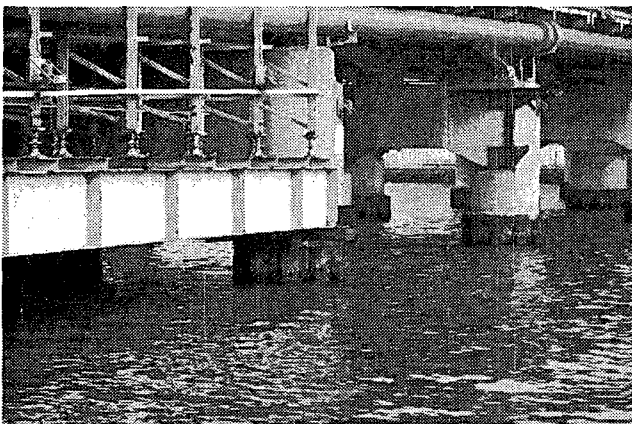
Tidal zone of corroded concrete pile and bridge base
